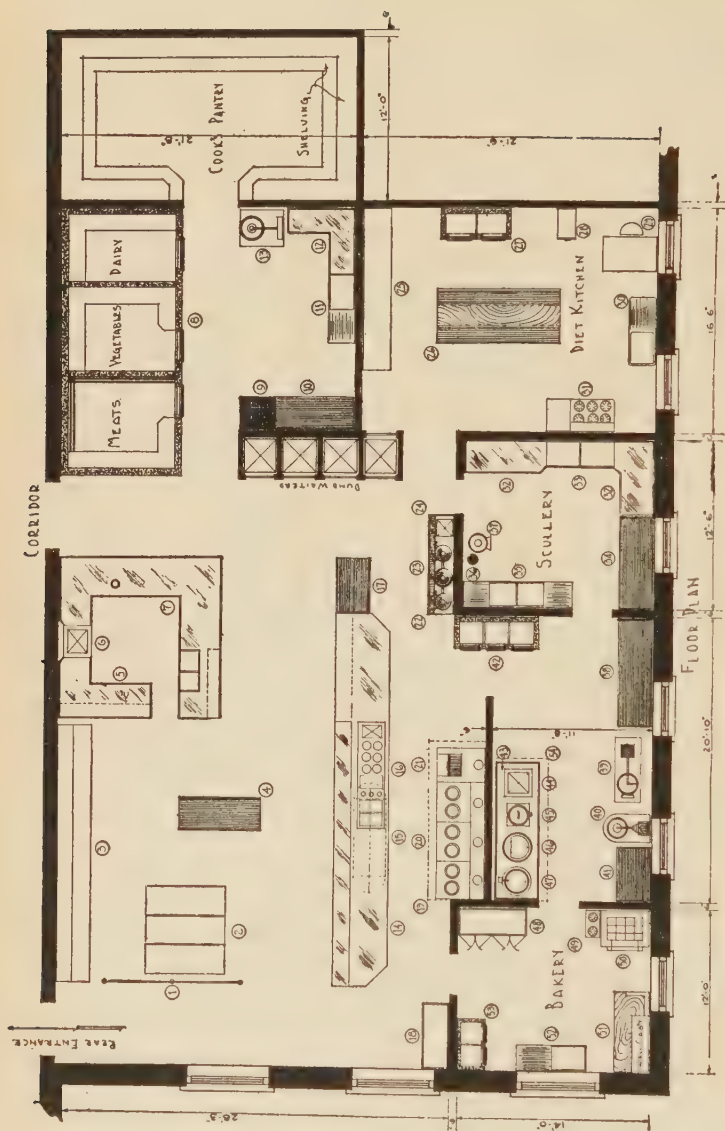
Plan of typical kitchen for a 125-bed hospital.
